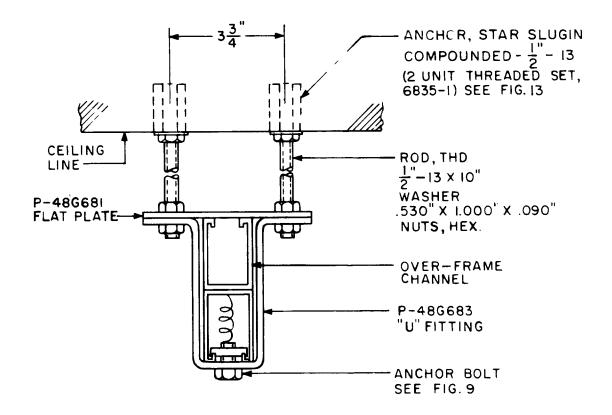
Fastening Overframe Channel to Ceiting at Vent Duct or Column Cap—Using Threaded Rod (A&M Only)
